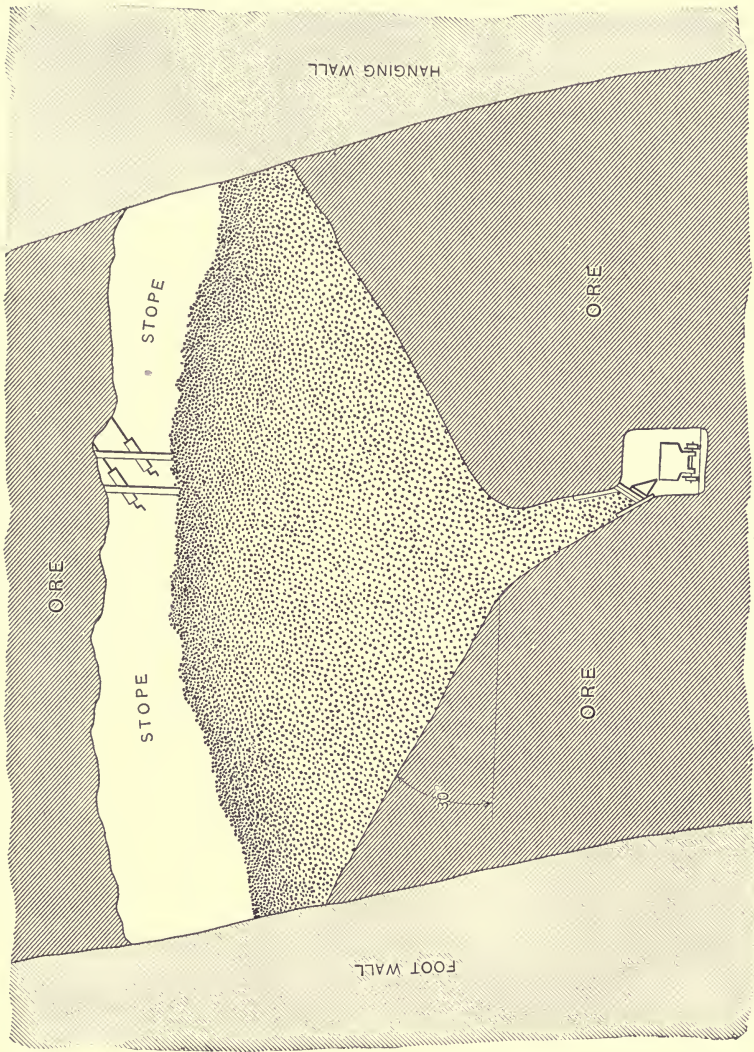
Vertical Section through Stope worked by Shrinkage Method.
